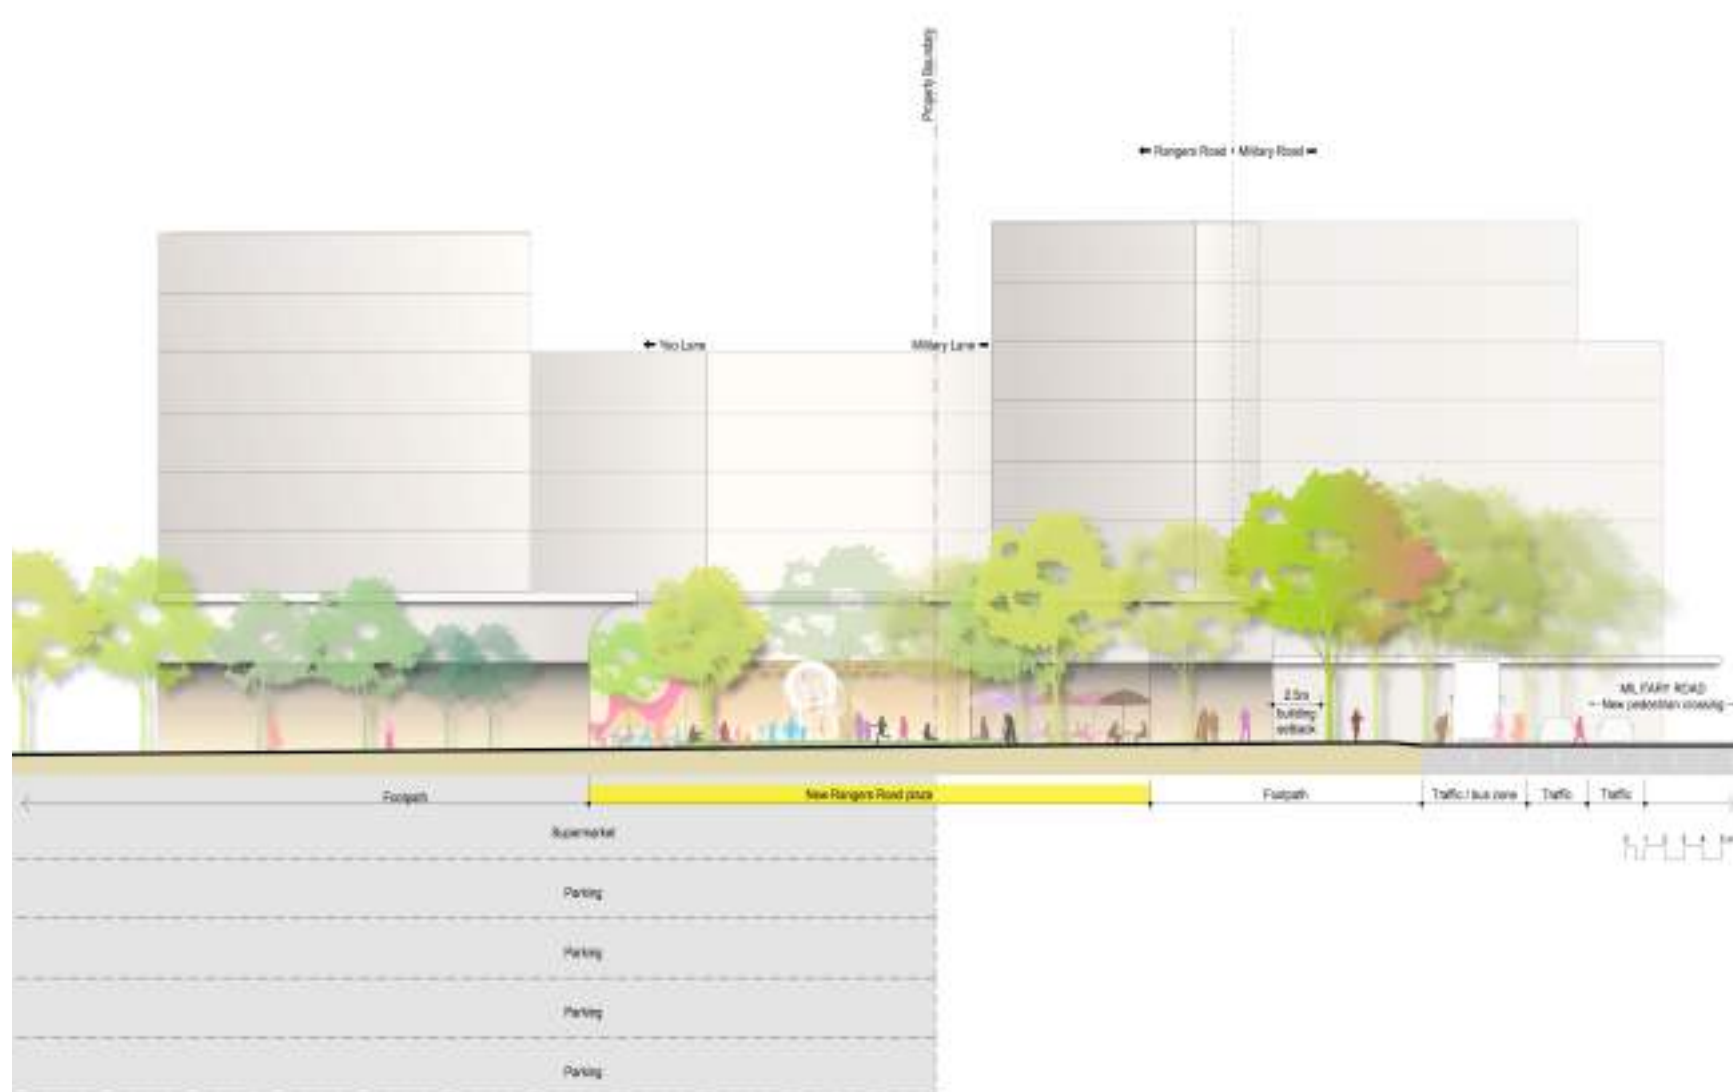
Elevation of Rangers Road Plaza from Rangers Road
